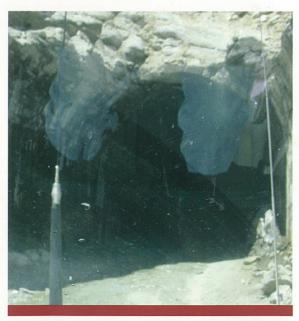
The highest tunnel in the world, Salang Tunnel, Hindu Kush mountains, Afghanistan, 2003. (The road and tunnel have since been substantially improved).
